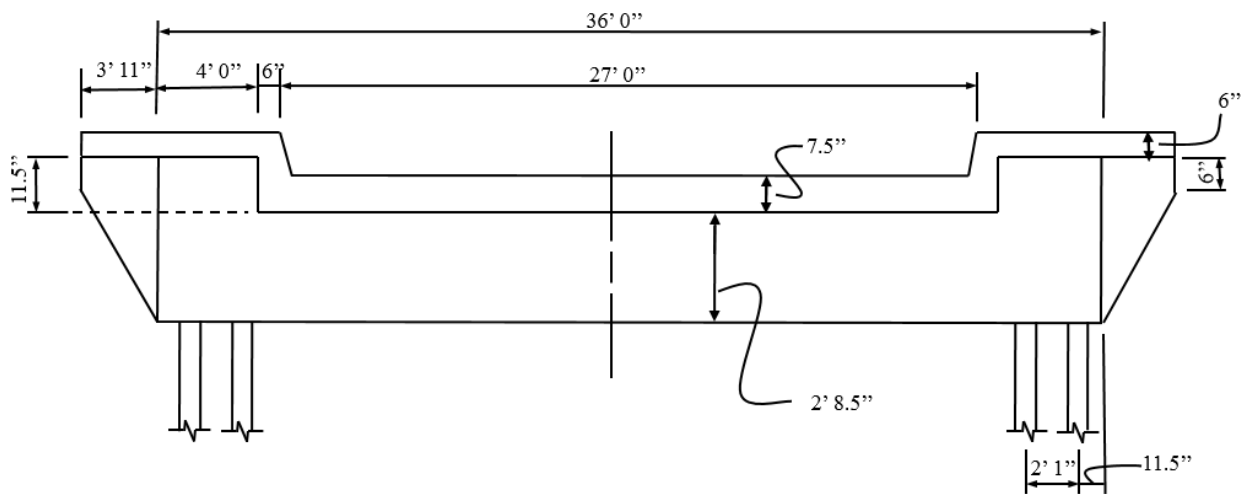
Typical Transverse Beam Dimensions for Spans VI and VII
